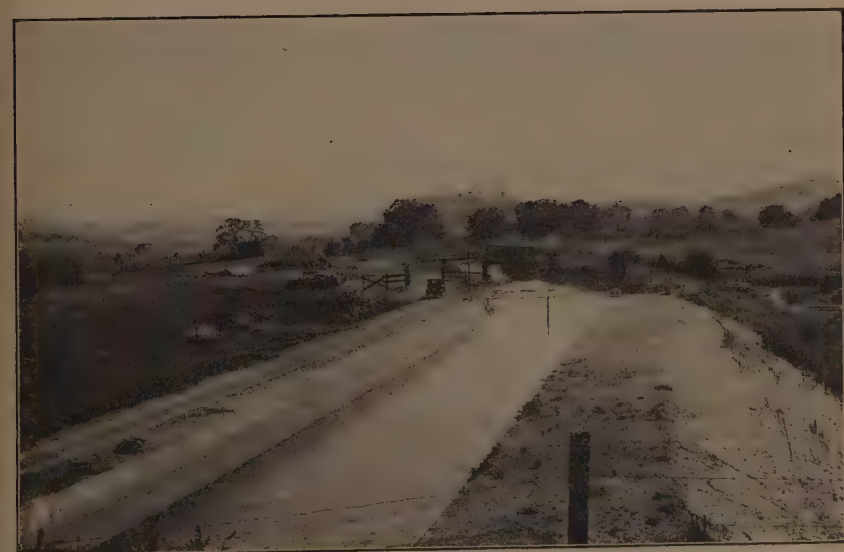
Hydraulic fill with concrete-lined channel, Modesto Canal.
